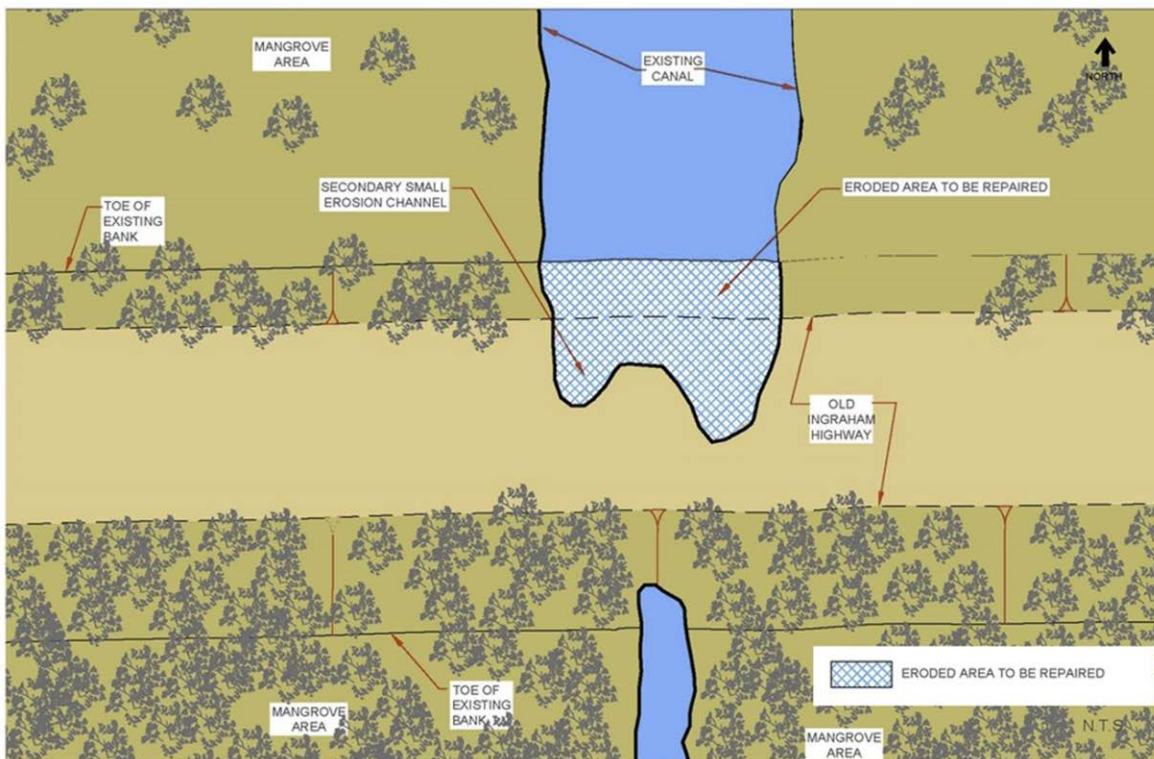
SLAGLE DITCH, PLUG EROSION REPAIR PLAN
